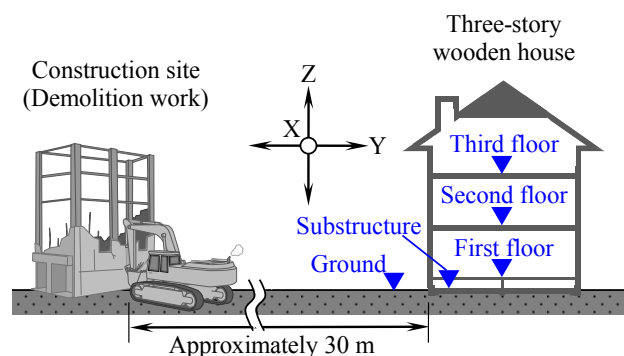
Measurement point arrangement in three-story wooden detached house near construction site doing demolition work.
